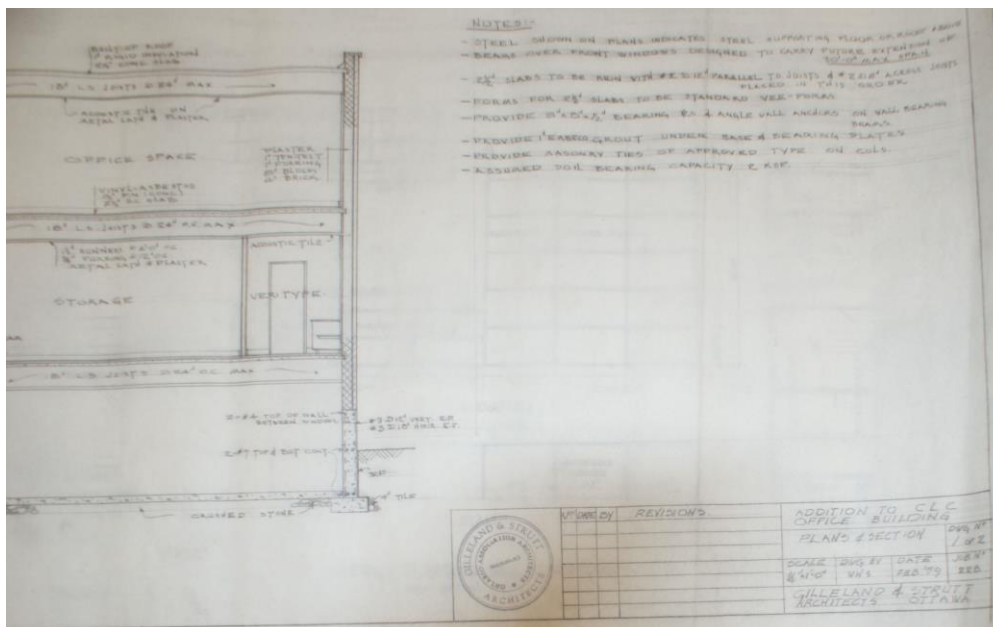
Partial plan and section of the 1959 addition. Note the steel columns embedded in the concrete block walls. Additionally, note the wide flange beams sizes supporting masonry walls above fenestrations as well as other locations. Source: LAC Lithwick Collection.
